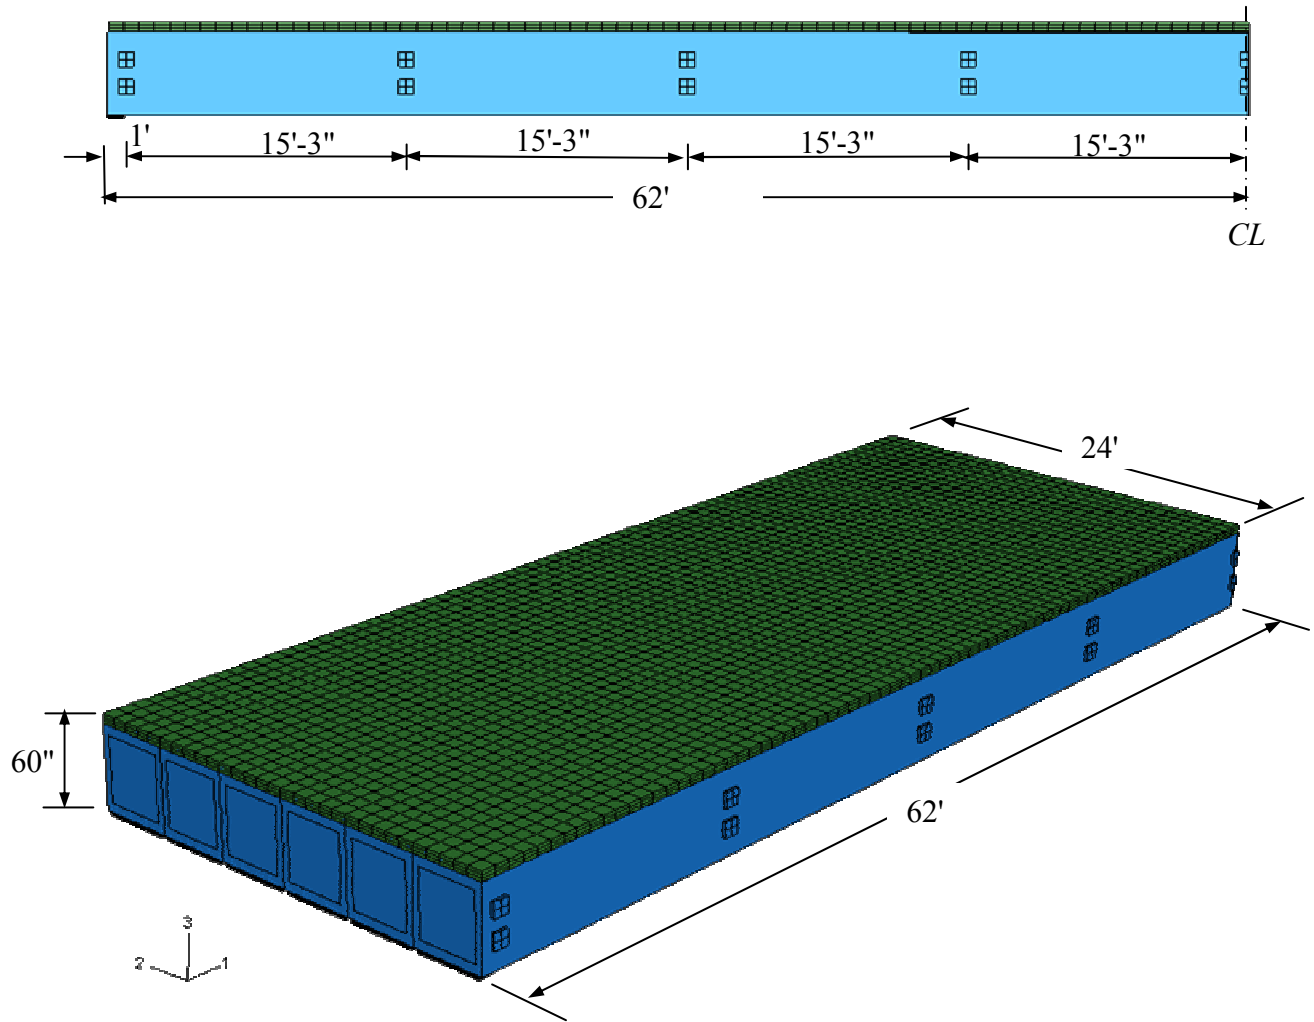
Modified assembly of 124 ft span bridge model.
